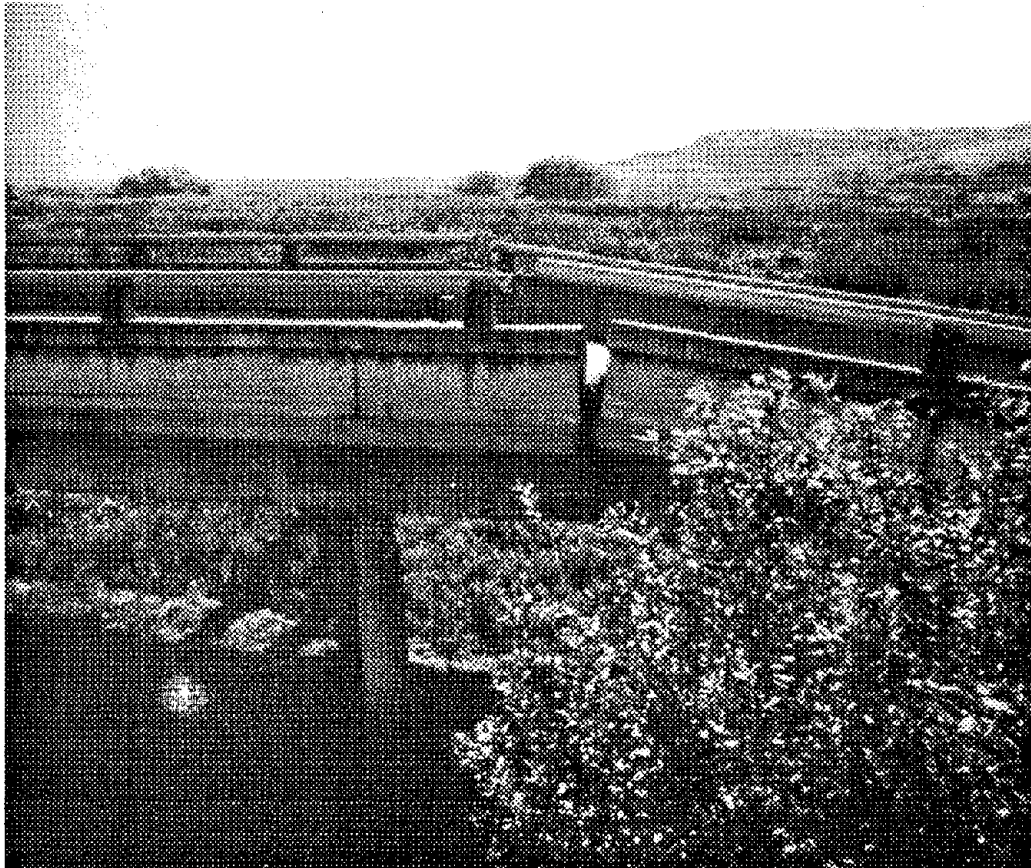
Elevation View of Damaged Bridge with Hinge Remaining Closed
